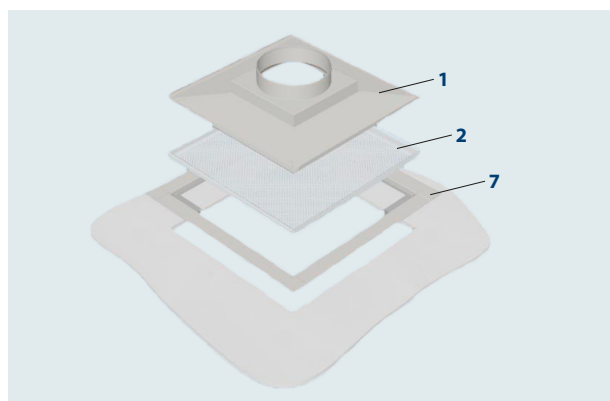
Opticlean with gypsum plasterboard ceiling mounting frame
